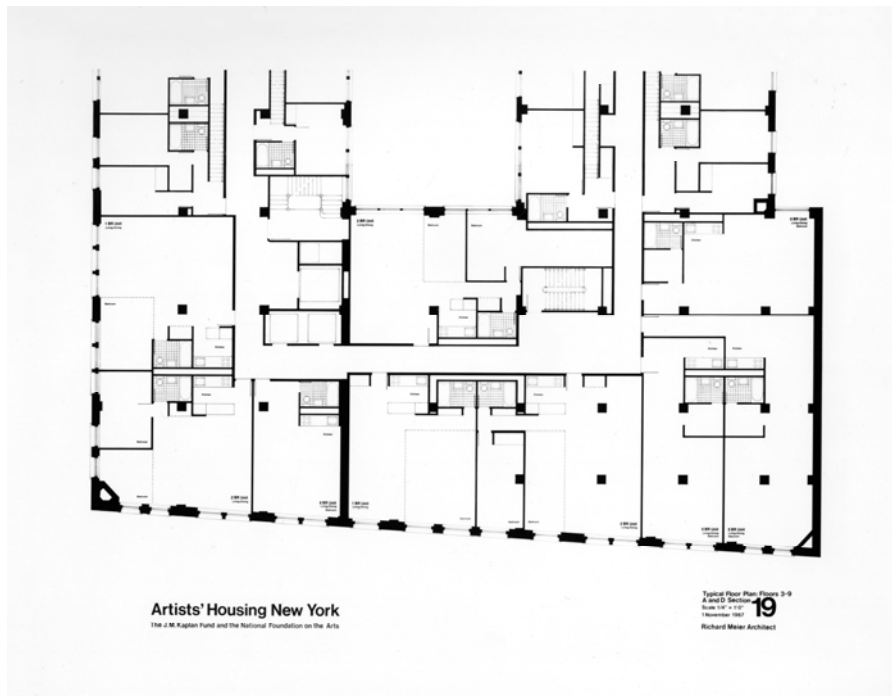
Westbeth Artists' Colony. Typical floor plan.
